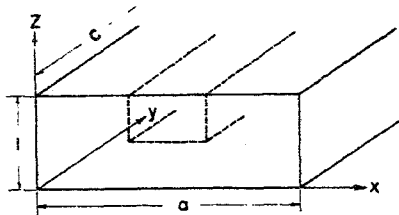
Simple model of No. 6 pier in Kobe Port.
